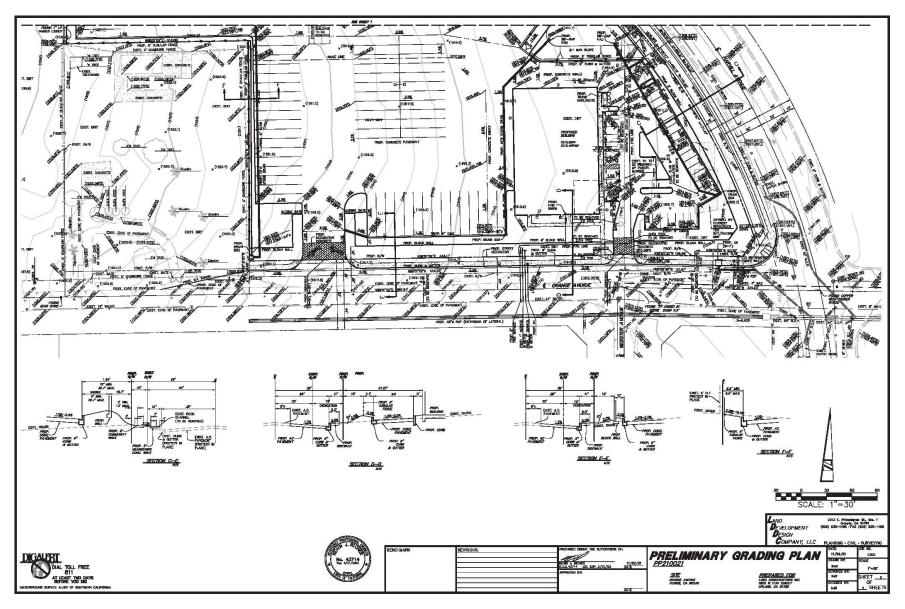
Conceptual Grading Plan Source: Van Dam Engineering
